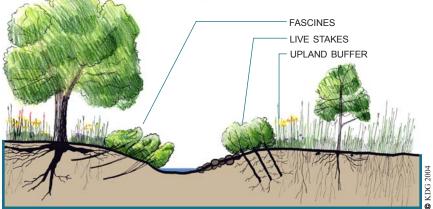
Pike Creek conceptual cross section. A range of soil bioengineering techniques were used, including fascines, live stakes, and upland buffer planting with native prairie seeds, bare root shrubs, and trees. A vegetation management plan was developed for the site that will maintain it as an open savanna community.
